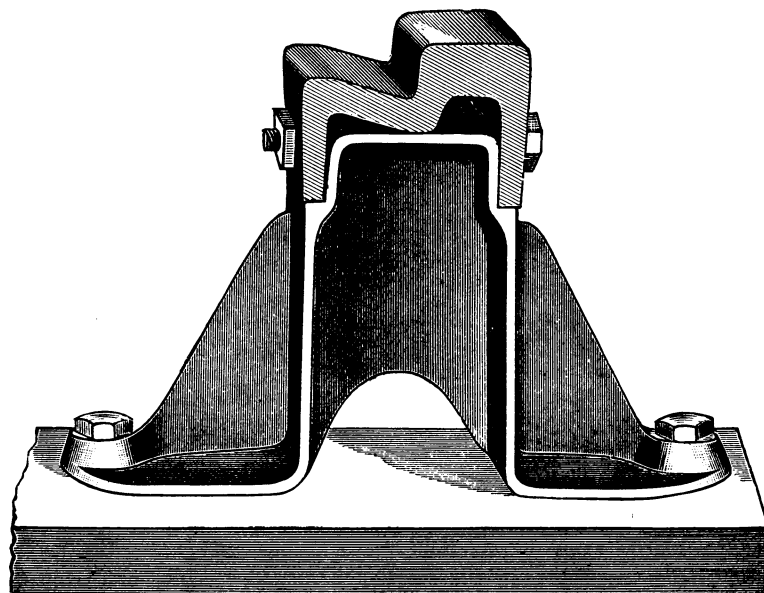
WHITE'S DOUBLE-GIRDER STREET-RAILWAY RAIL.
